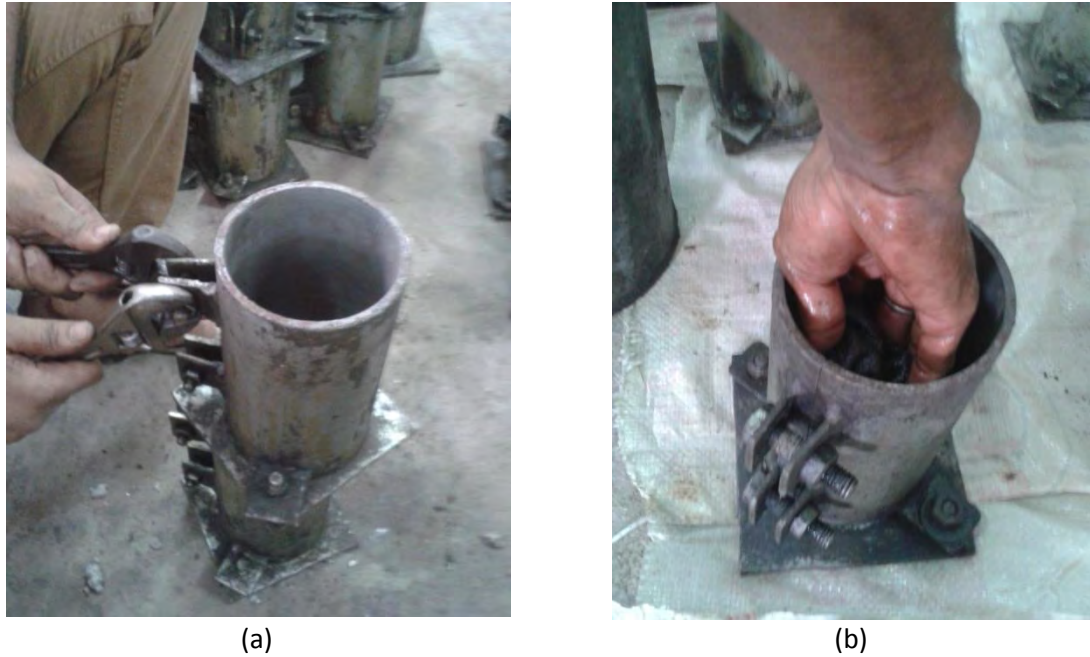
Mold preparation for casting(a) Tightening (b)Lubricating
